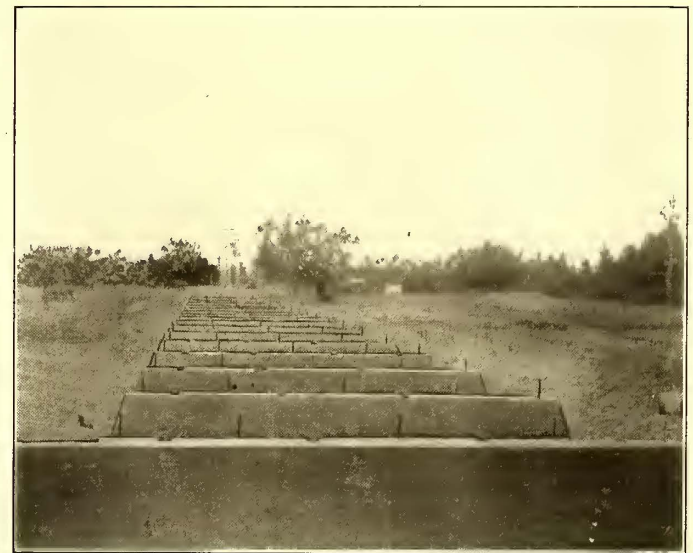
CONCRETE PIER CONSTRUCTION WITHOUT POSTS
